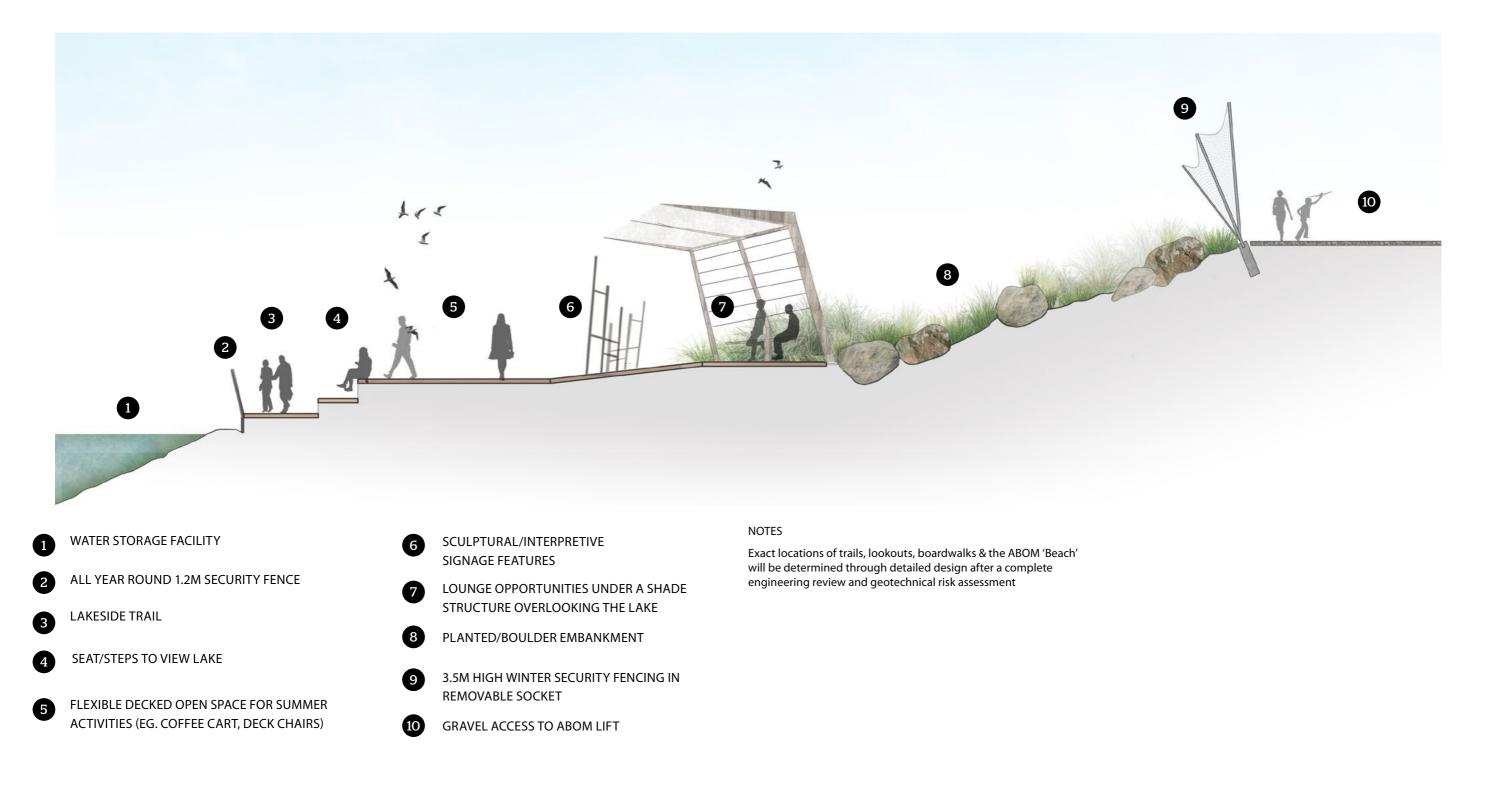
ABOM Boardwalk & Viewing Deck-Landscape Section
